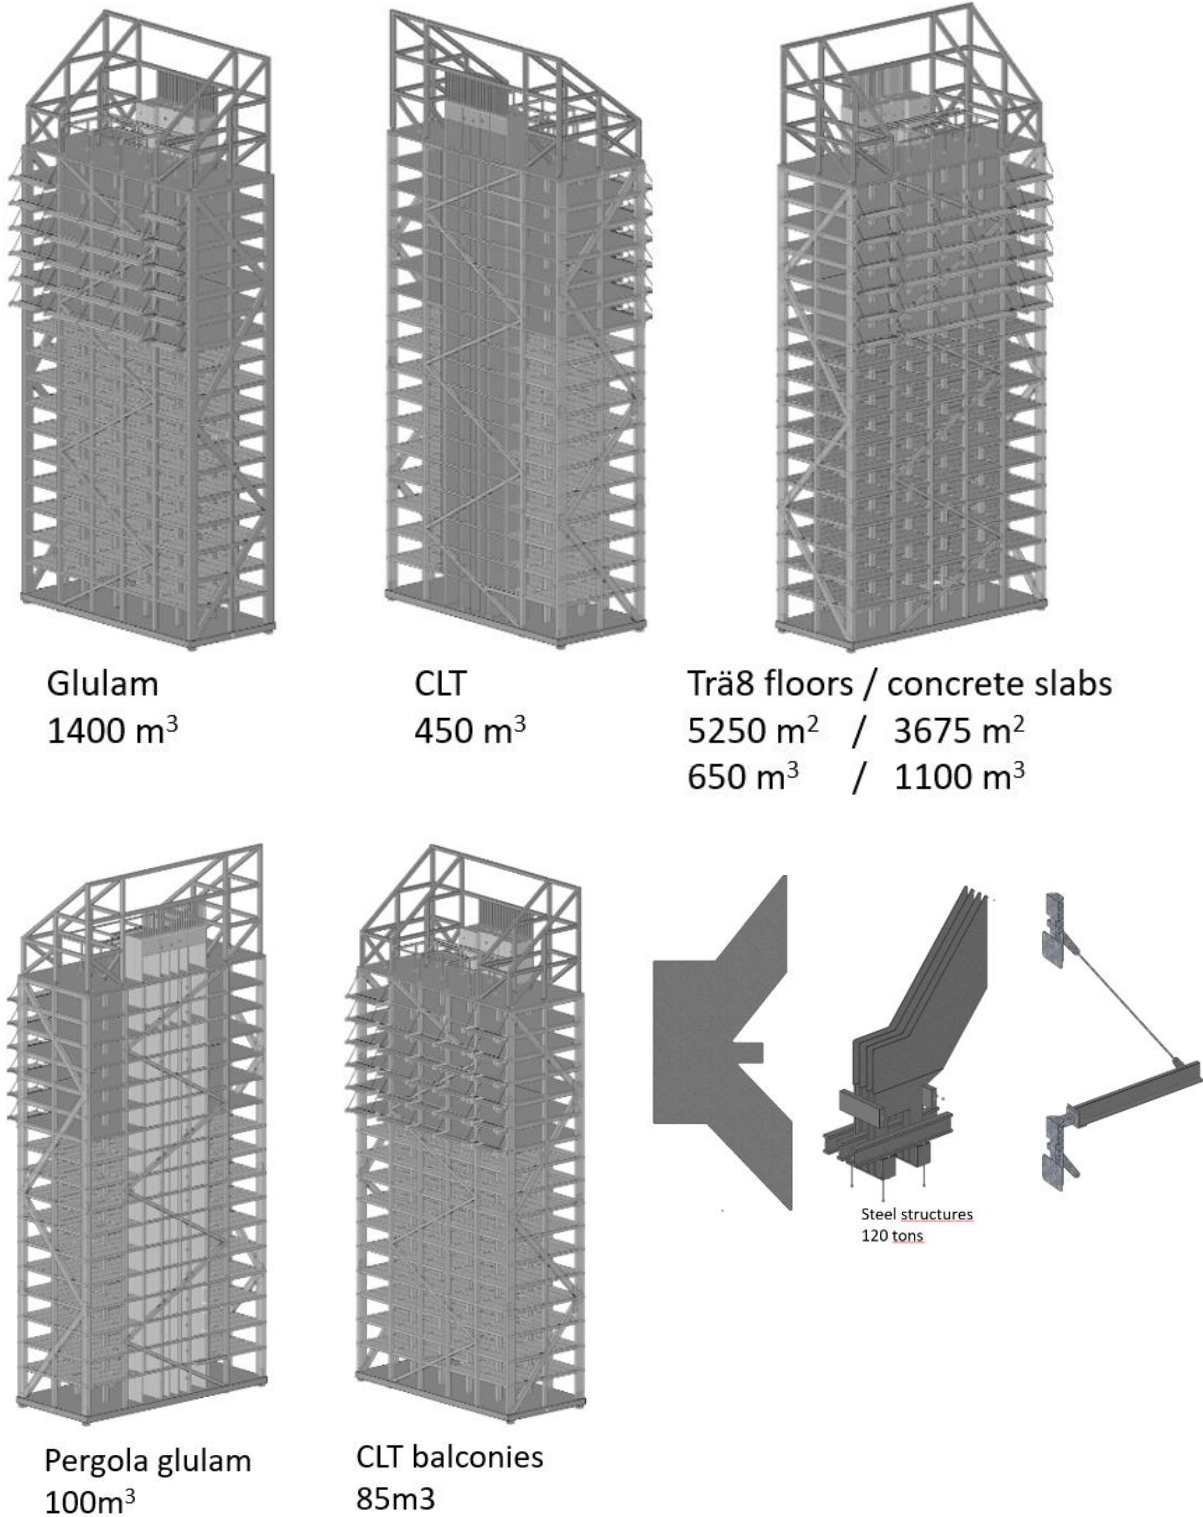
Highlighted volumes used in the building's structure. Please note that timber volumes used in exterior wall elements are not included
